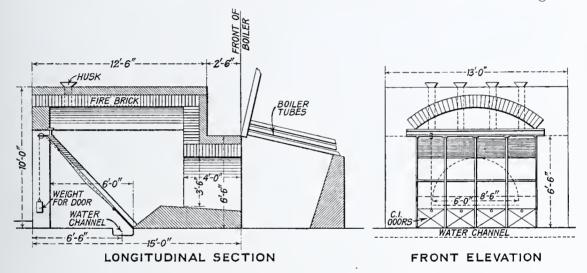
Furnace for firing Paddy Husks in connection with a Water Tube Boiler.
